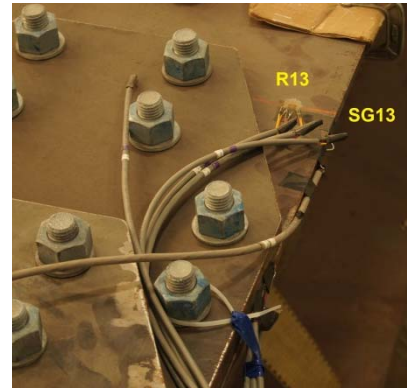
Strain rosette (R13) and strain gage (SG13) mounted onto the top flange
